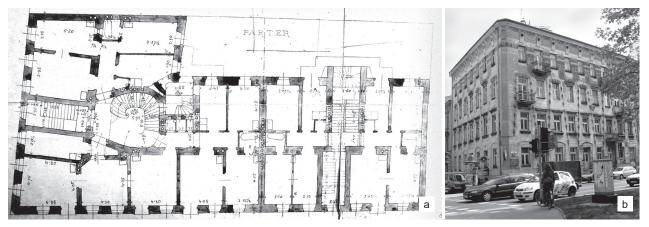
Townhouse at 15 Krasińskiego Avenue / 26 Smoleńsk Street (designed by A. Pezdański, 1907–1908): a) ground floor plan (source: ANK, ABM Krasińskiego 15, fsc. 446), b) façade (photo by B. Makowska)
